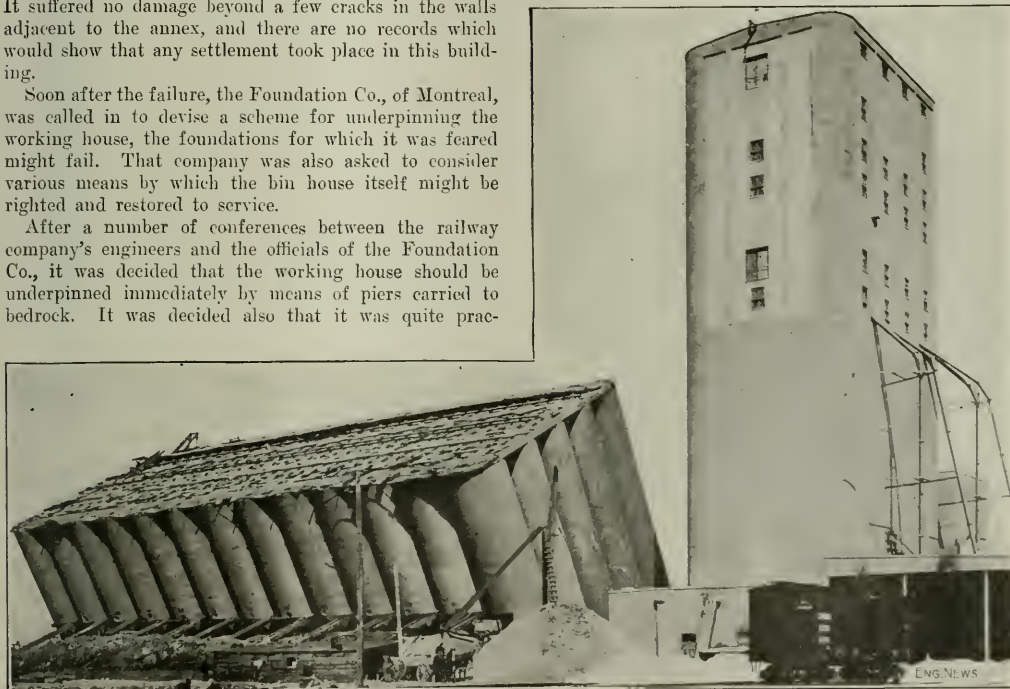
THE STORAGE SECTION OR BIN HOUSE OF THE ELEVATOR IN ITS TILTED POSITION, WITH SHORING IN PLACE. AT THE RIGHT IS THE WORKING HOUSE
